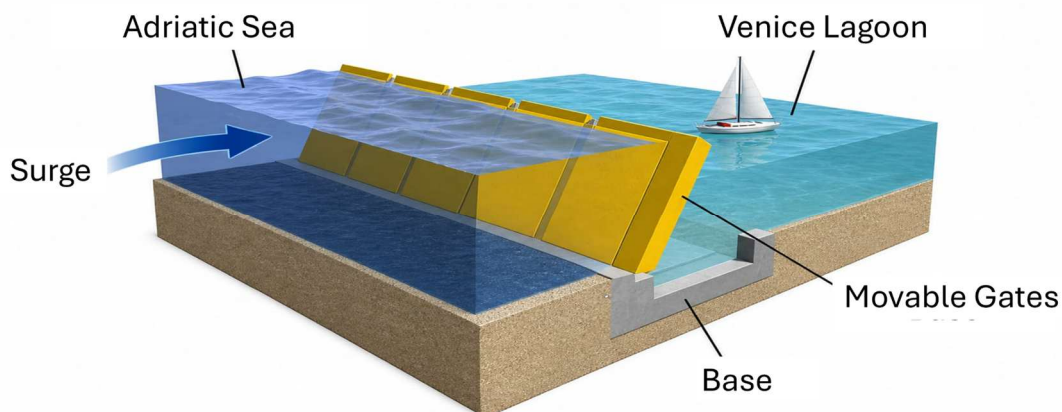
The schematic principle of Progetto MOSE flood surge barriers with barriers raised
